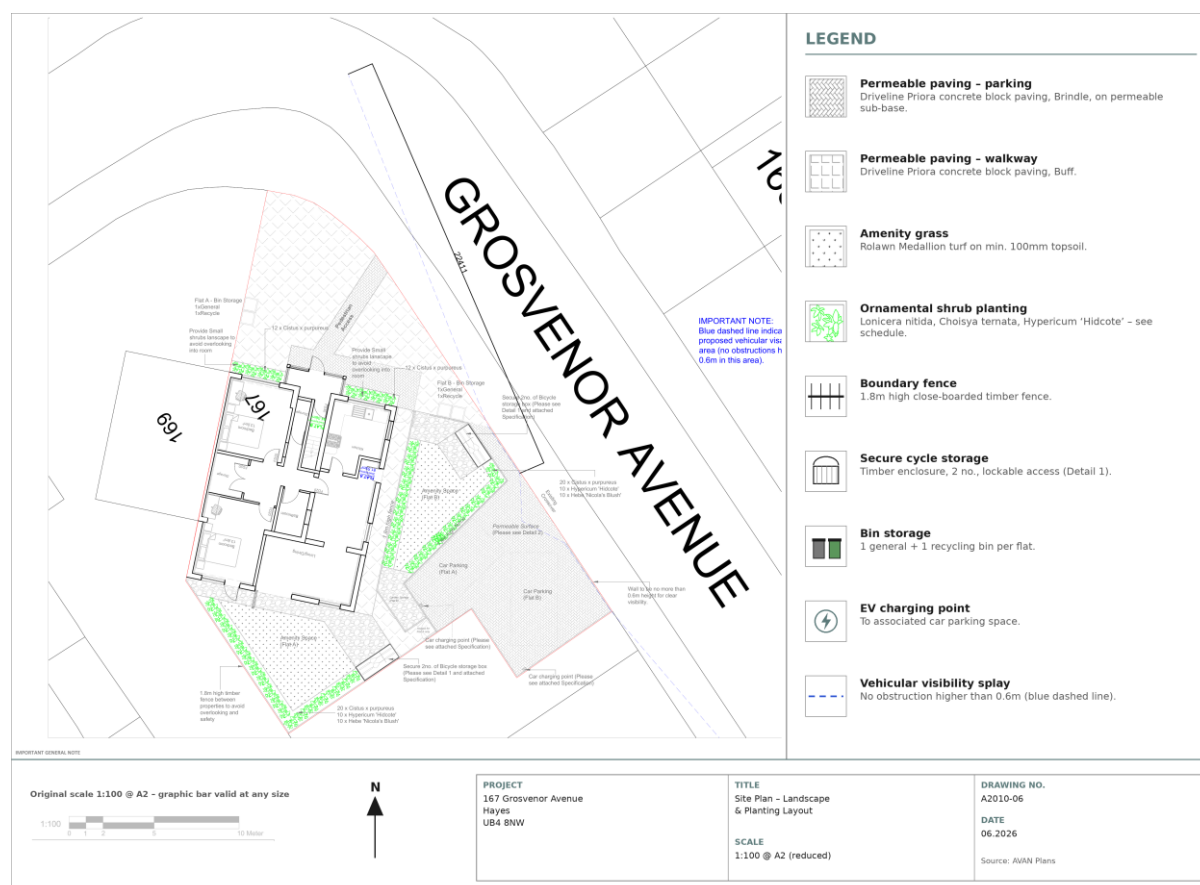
Proposed site plan with legend, scale bar, north point and title block: planting and hard landscape layout (based on AVAN Plans Drawing A2010-06; refer to the planting schedule for current species)
